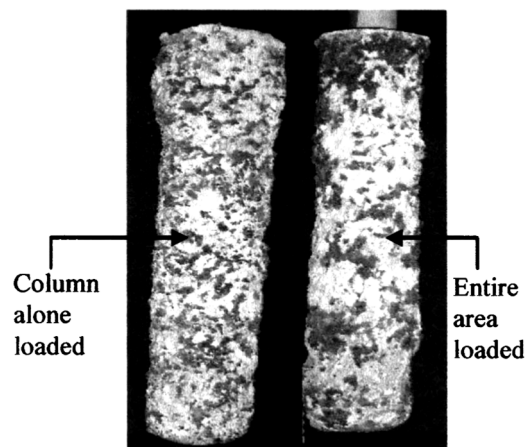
Typical column deformation post testing (Ambily & Gandhi, 2007)
